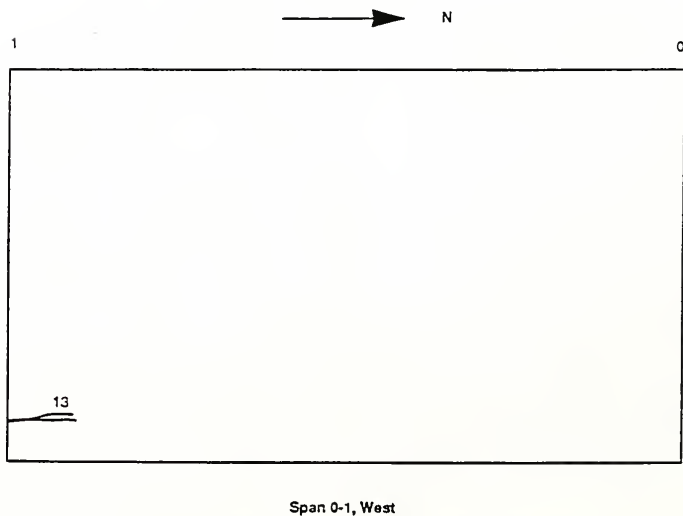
Crack Patterns, Bridge # 7-40-6527
